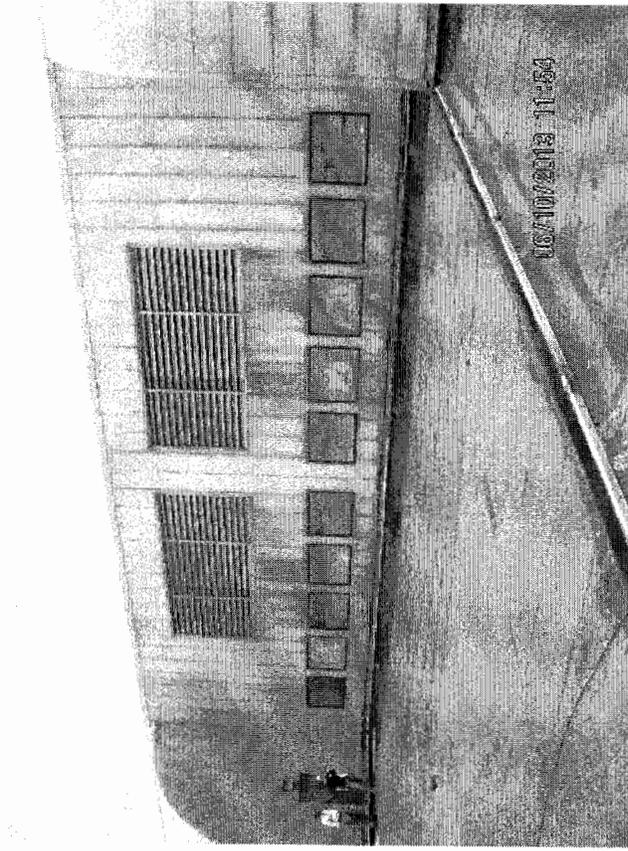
Third District Courthouse-Rolling Meadows-Typical windows
